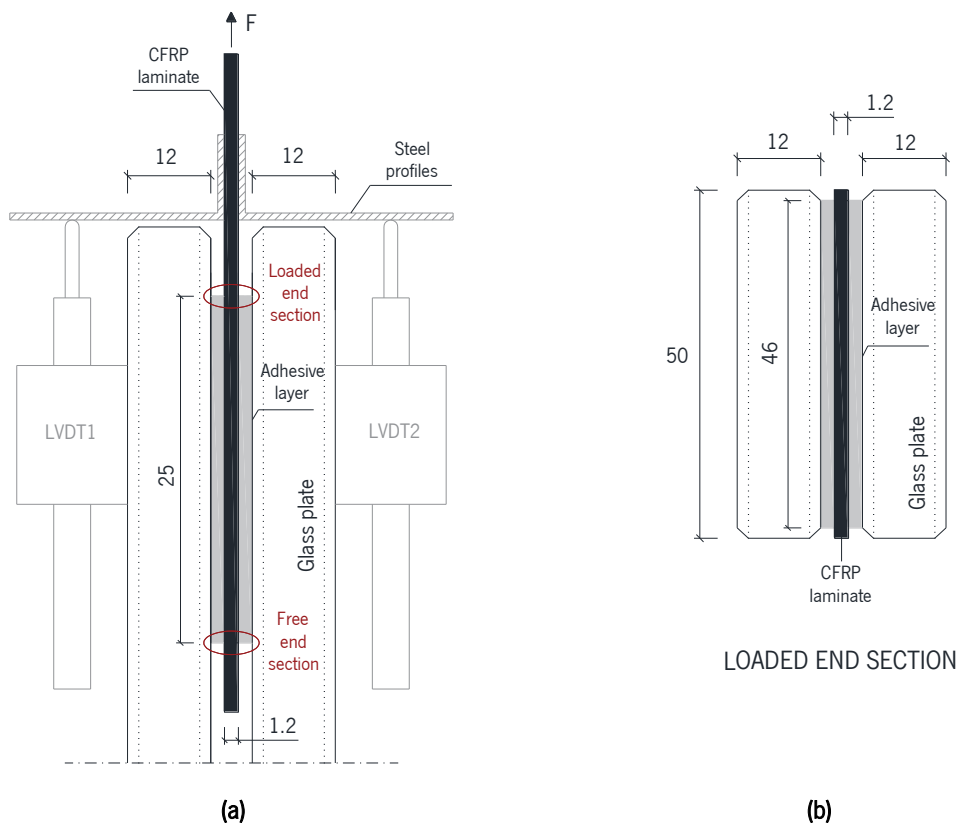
Double-lap joint tests: (a) specimen's geometry; and (b) loaded end section. Units in [mm].
